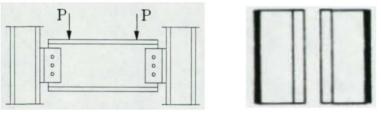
(a) Test setup, and (b) connection detail of Test No. 4 (McMullin and Astaneh, 1988)
